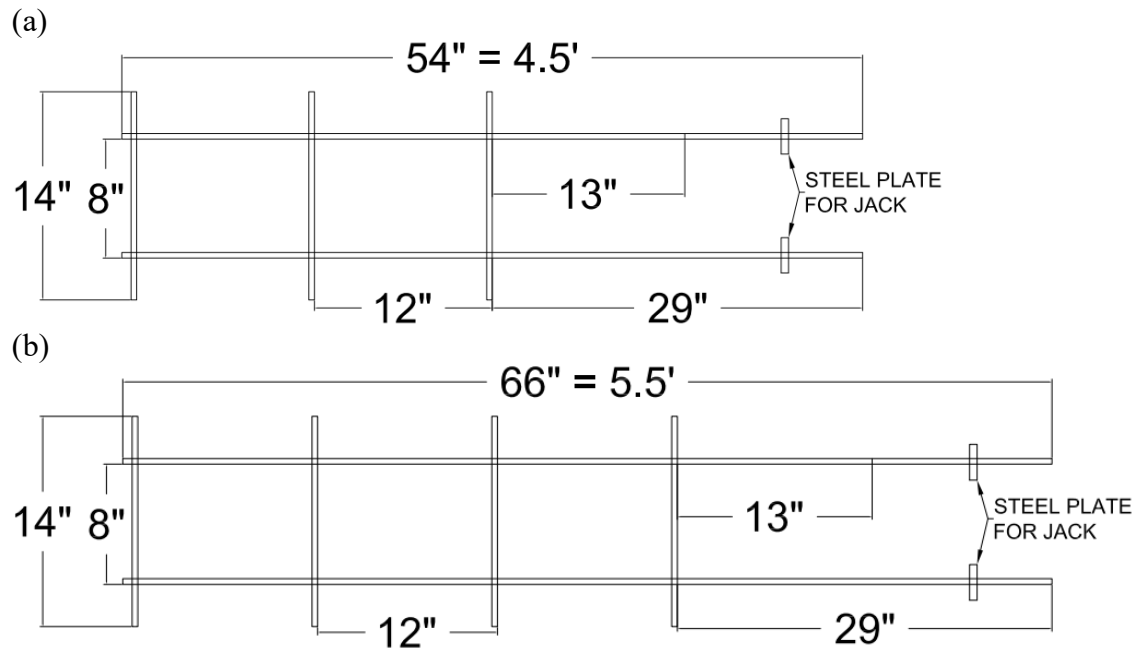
Auto CAD drawings showing (a) plan view of 4.5-foot reinforcements and (b) plan view of 5.5-foot reinforcements for pull-out testing.
